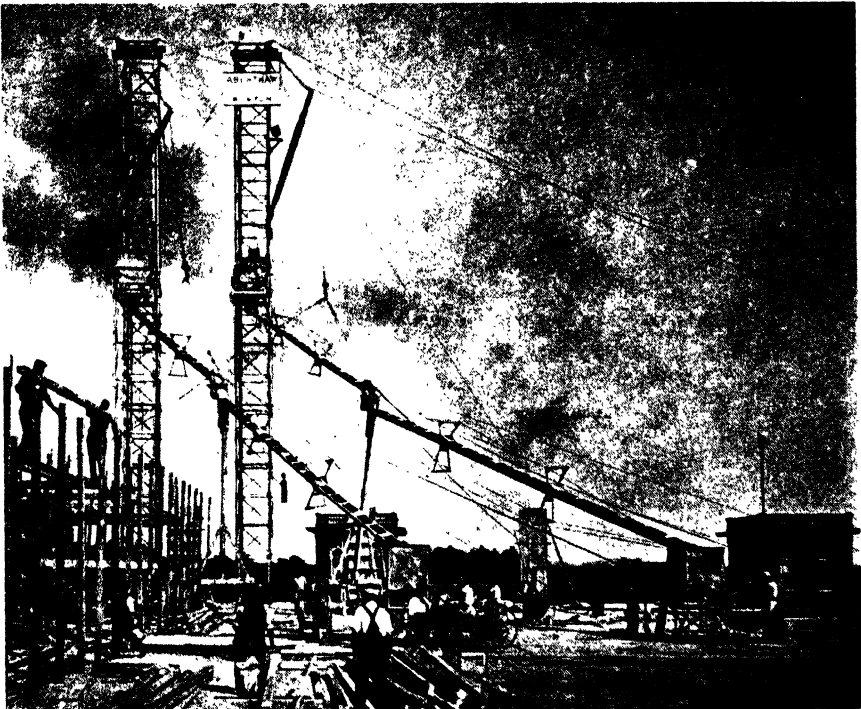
Chuting from Towers to Floor Hoppers. (Courtesy Aberthaw Construction Co.)
